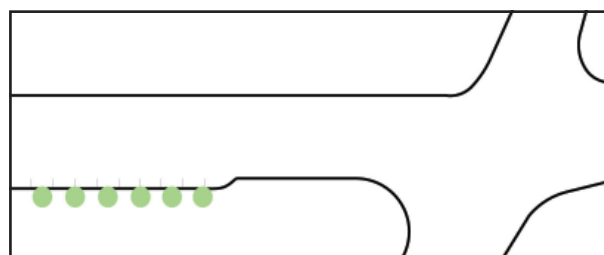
Recommended: Angled parking has been replaced with parallel parking; the sidewalk is widened at the intersection.
